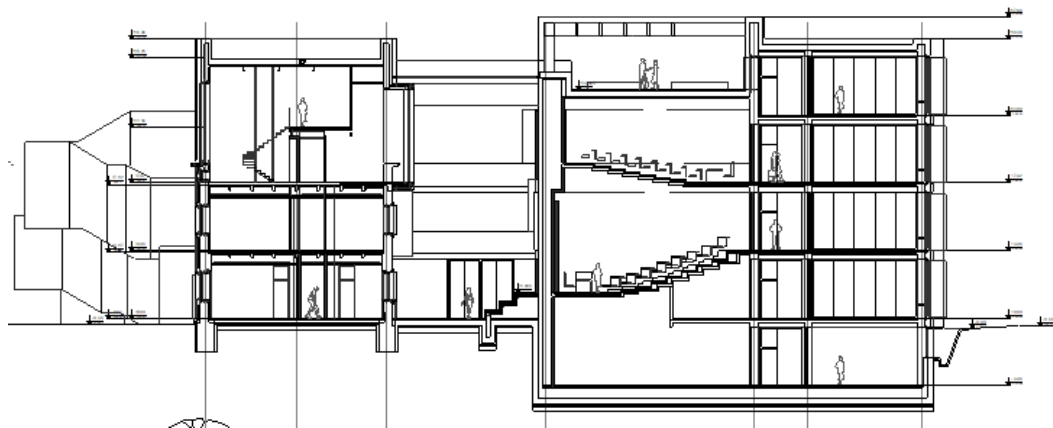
Cross section - steel structure upgraded last floor in the old part on the left and steel structure with glass roof space between the old and new part of the building (Photo by author)
